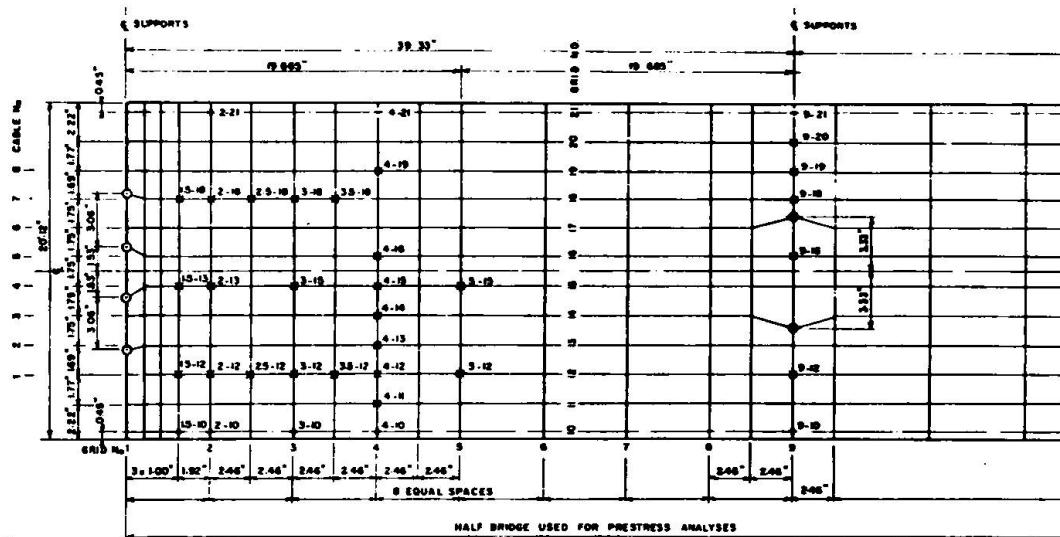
One Half Plan View of 1/36 Scale Model Showing Gauge and Cable Locations
